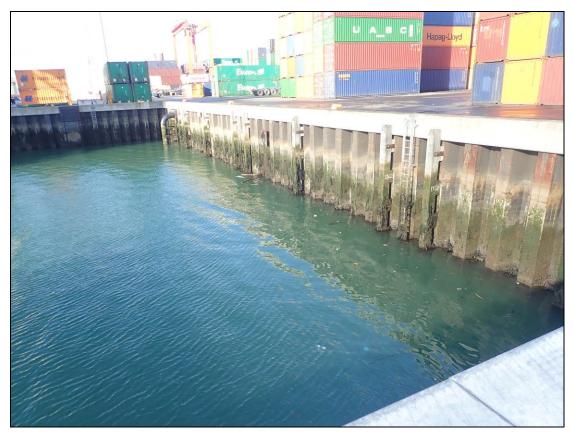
View looking west across north end of Berth 50 where the floating pontoon will be installed, attached to the existing Larsen piles.
